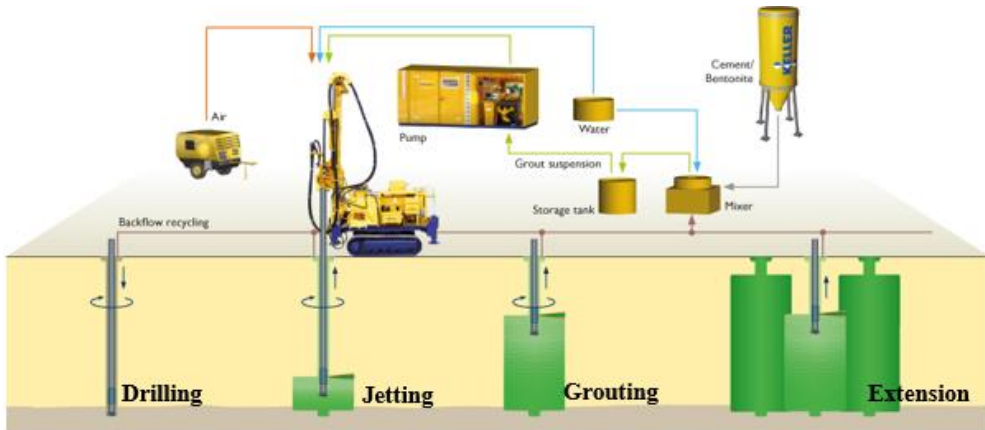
A typical jet grouting set-up and working procedure (source: Keller group)
